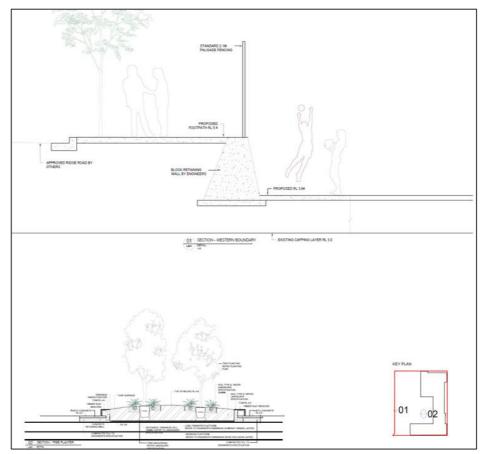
| Landscape sections to Ridge Road and central courtyard (Applicant's RtS to the AR 2022)
